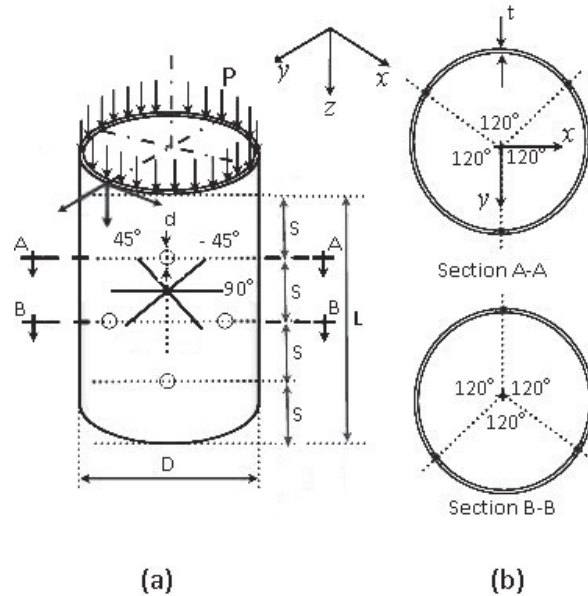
Typical perforation arrangement in specimens: (a) tube geometry and longitudinal arrangement of the perforations, (b) cross sections showing the circumferential arrangement of the perforations
